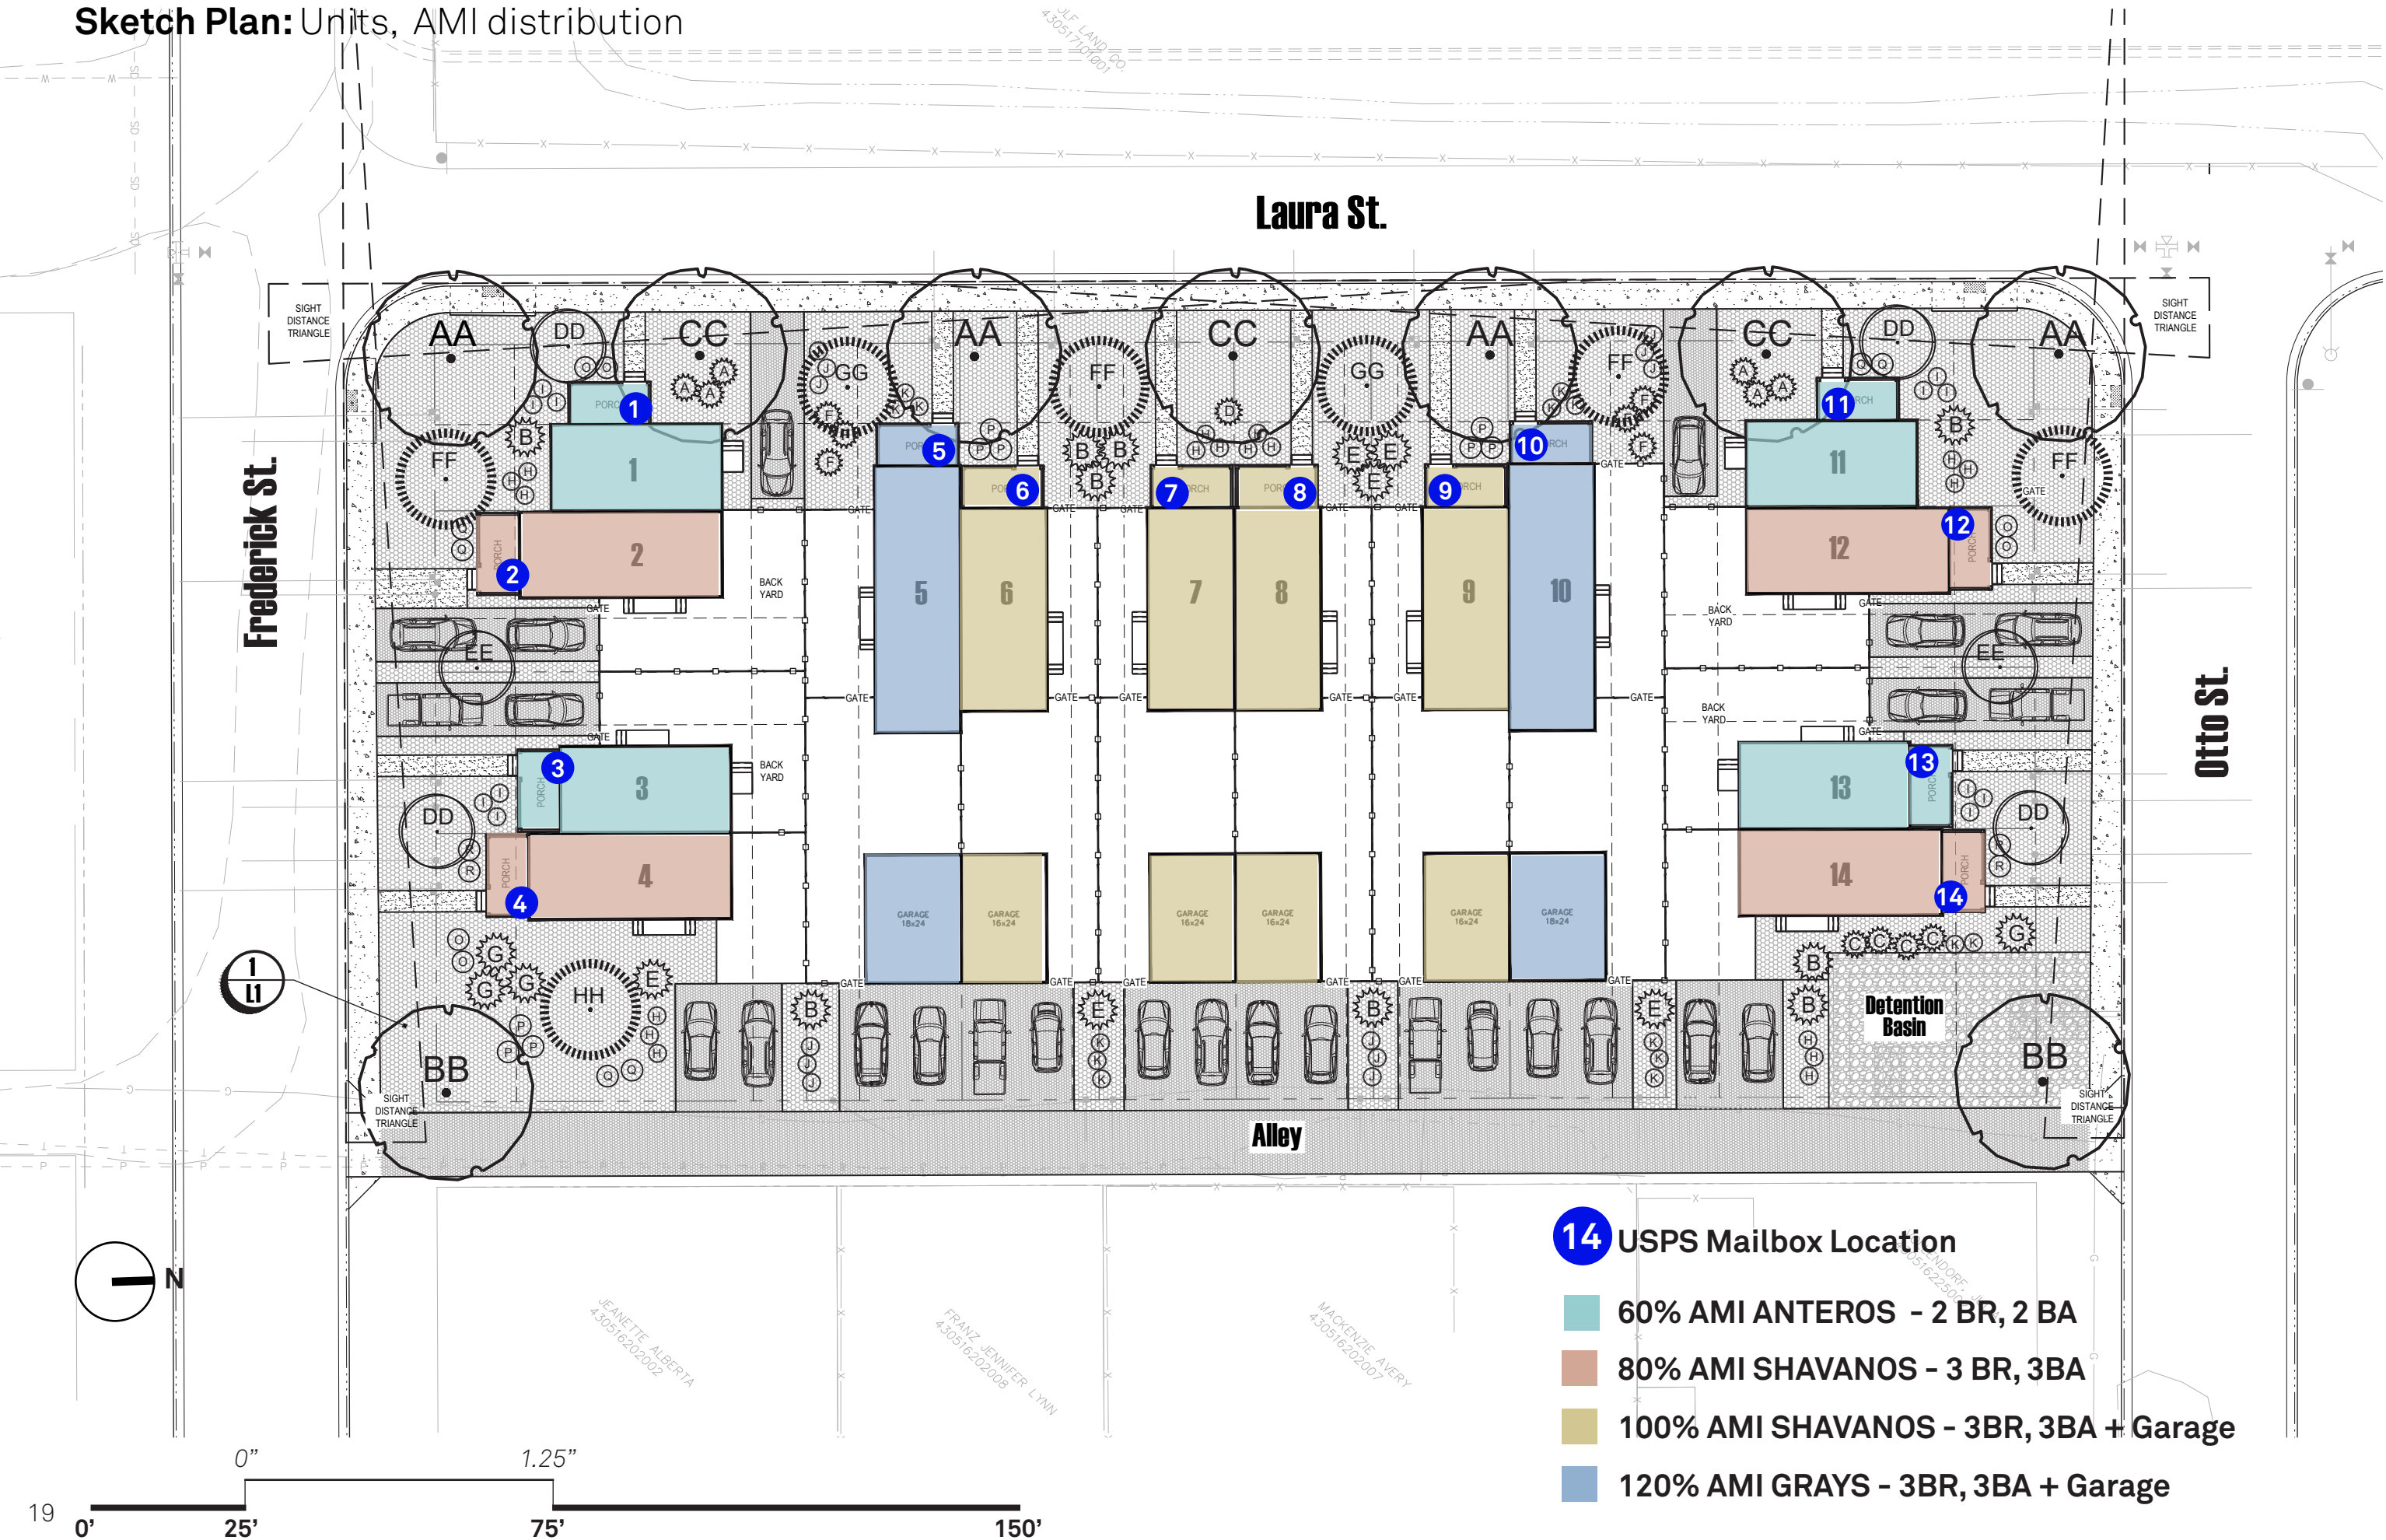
buildings, 3 unit-types, 14 units, 60-120% AMI
